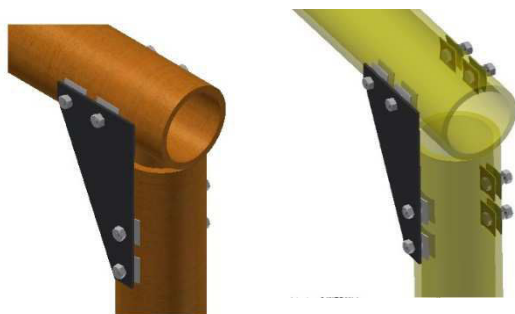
Gusset plate connection using preloaded bolts and curved steel washers.
